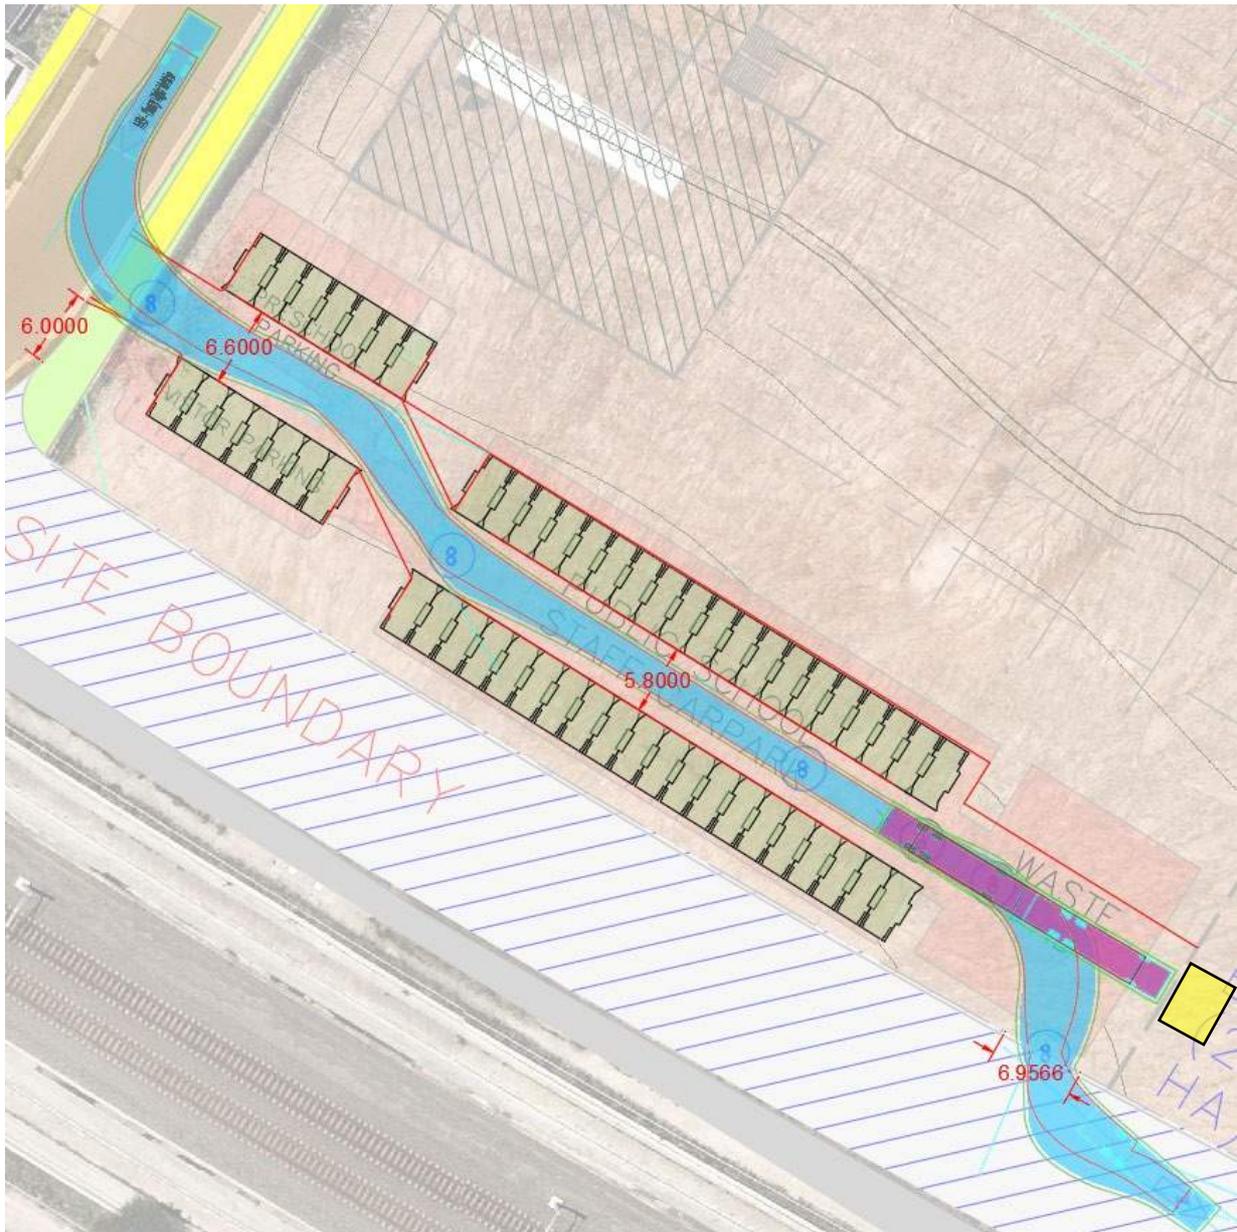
Waste collection – inbound at Faulkner Way; outbound at future south road – front loader (recommended)
